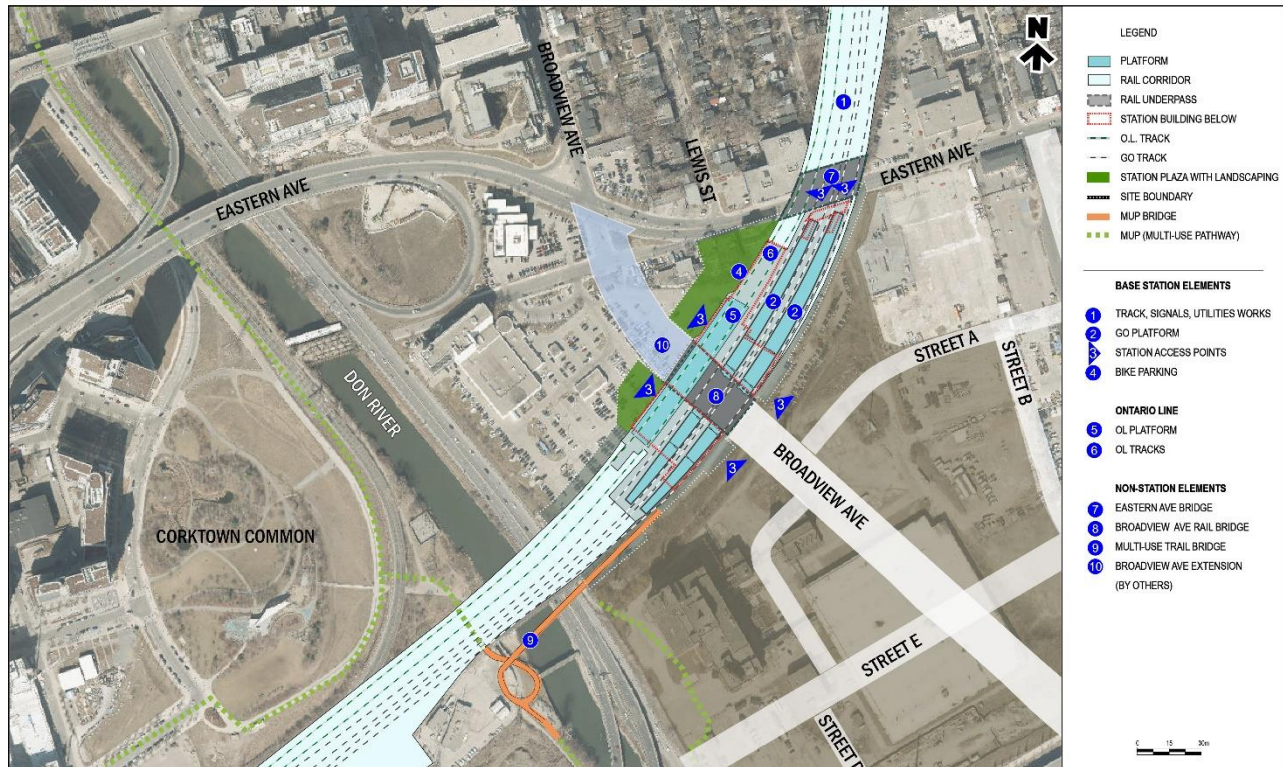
Conceptual plan of East Harbour Station. Source: City of Toronto (Based on site plan by Metrolinx, February 2023). Note: Station plan shown above is indicative and does not represent a final design.
